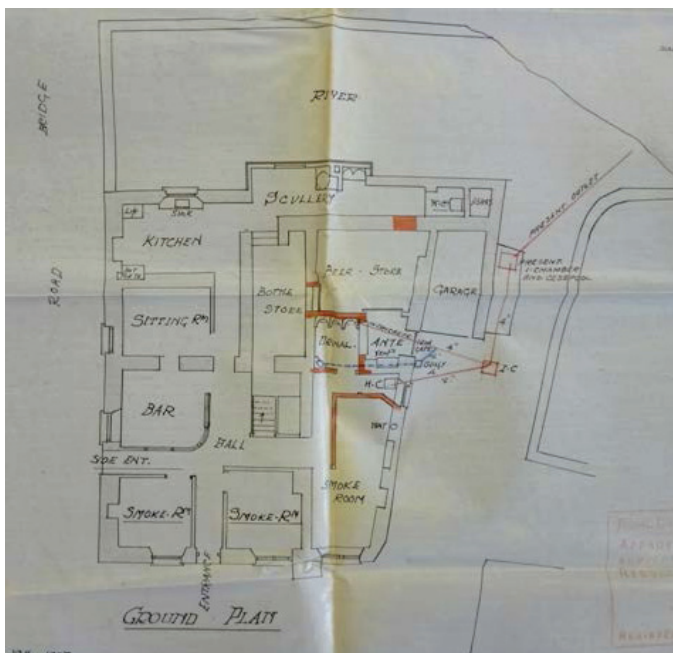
(left): Proposed ground floor plan (CAC(B) BSRDNL/3/252 1923)
